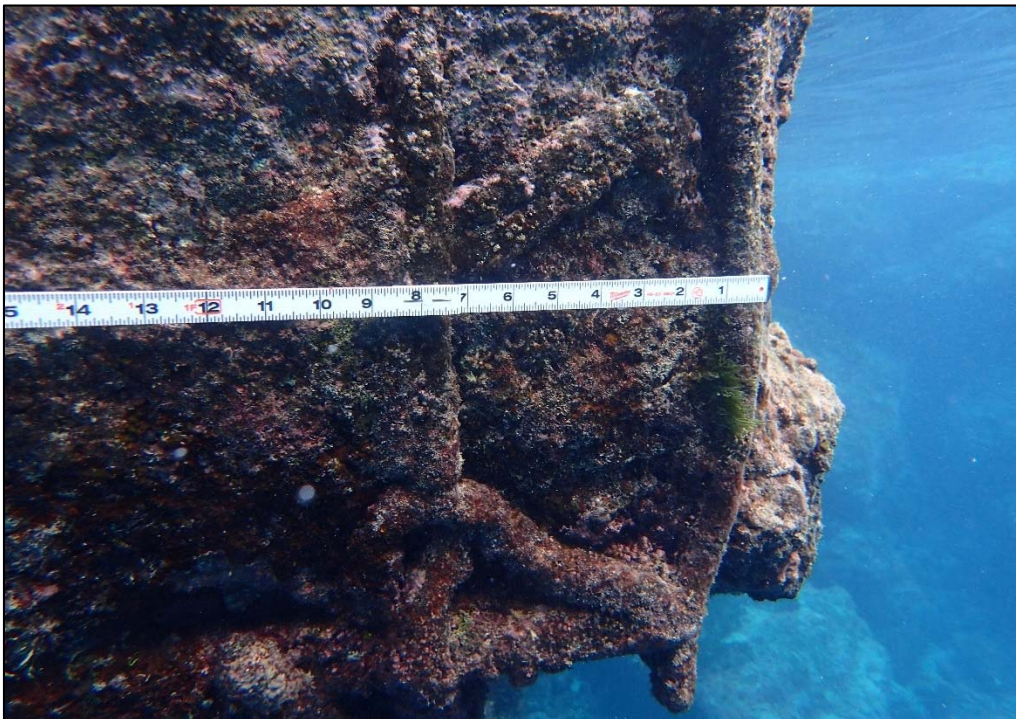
Berth 1 concrete cap. Damage found at the southwest corner seen from below water. Two vertical and one horizontal bars are exposed with minor steel section loss observed.
